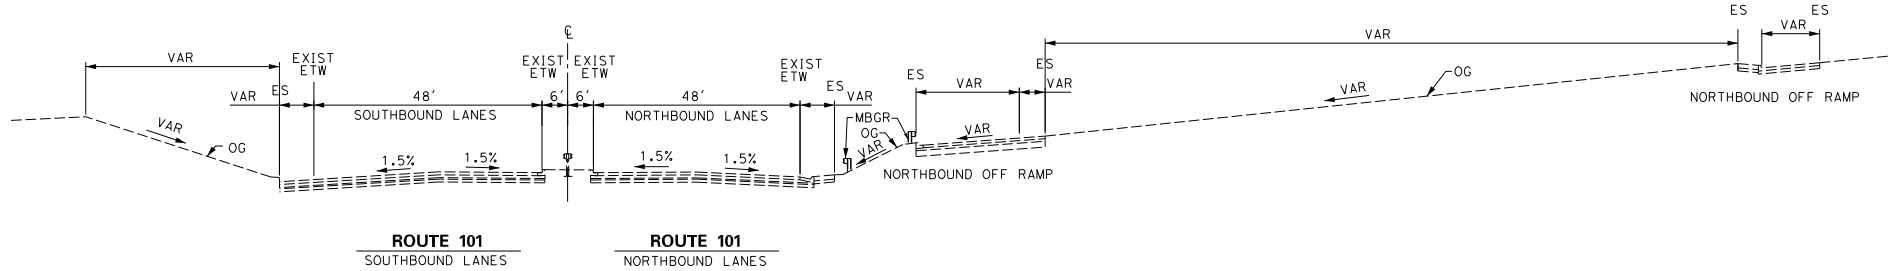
Existing Freeway Typical Section Between Sunset Boulevard and Harold Way
